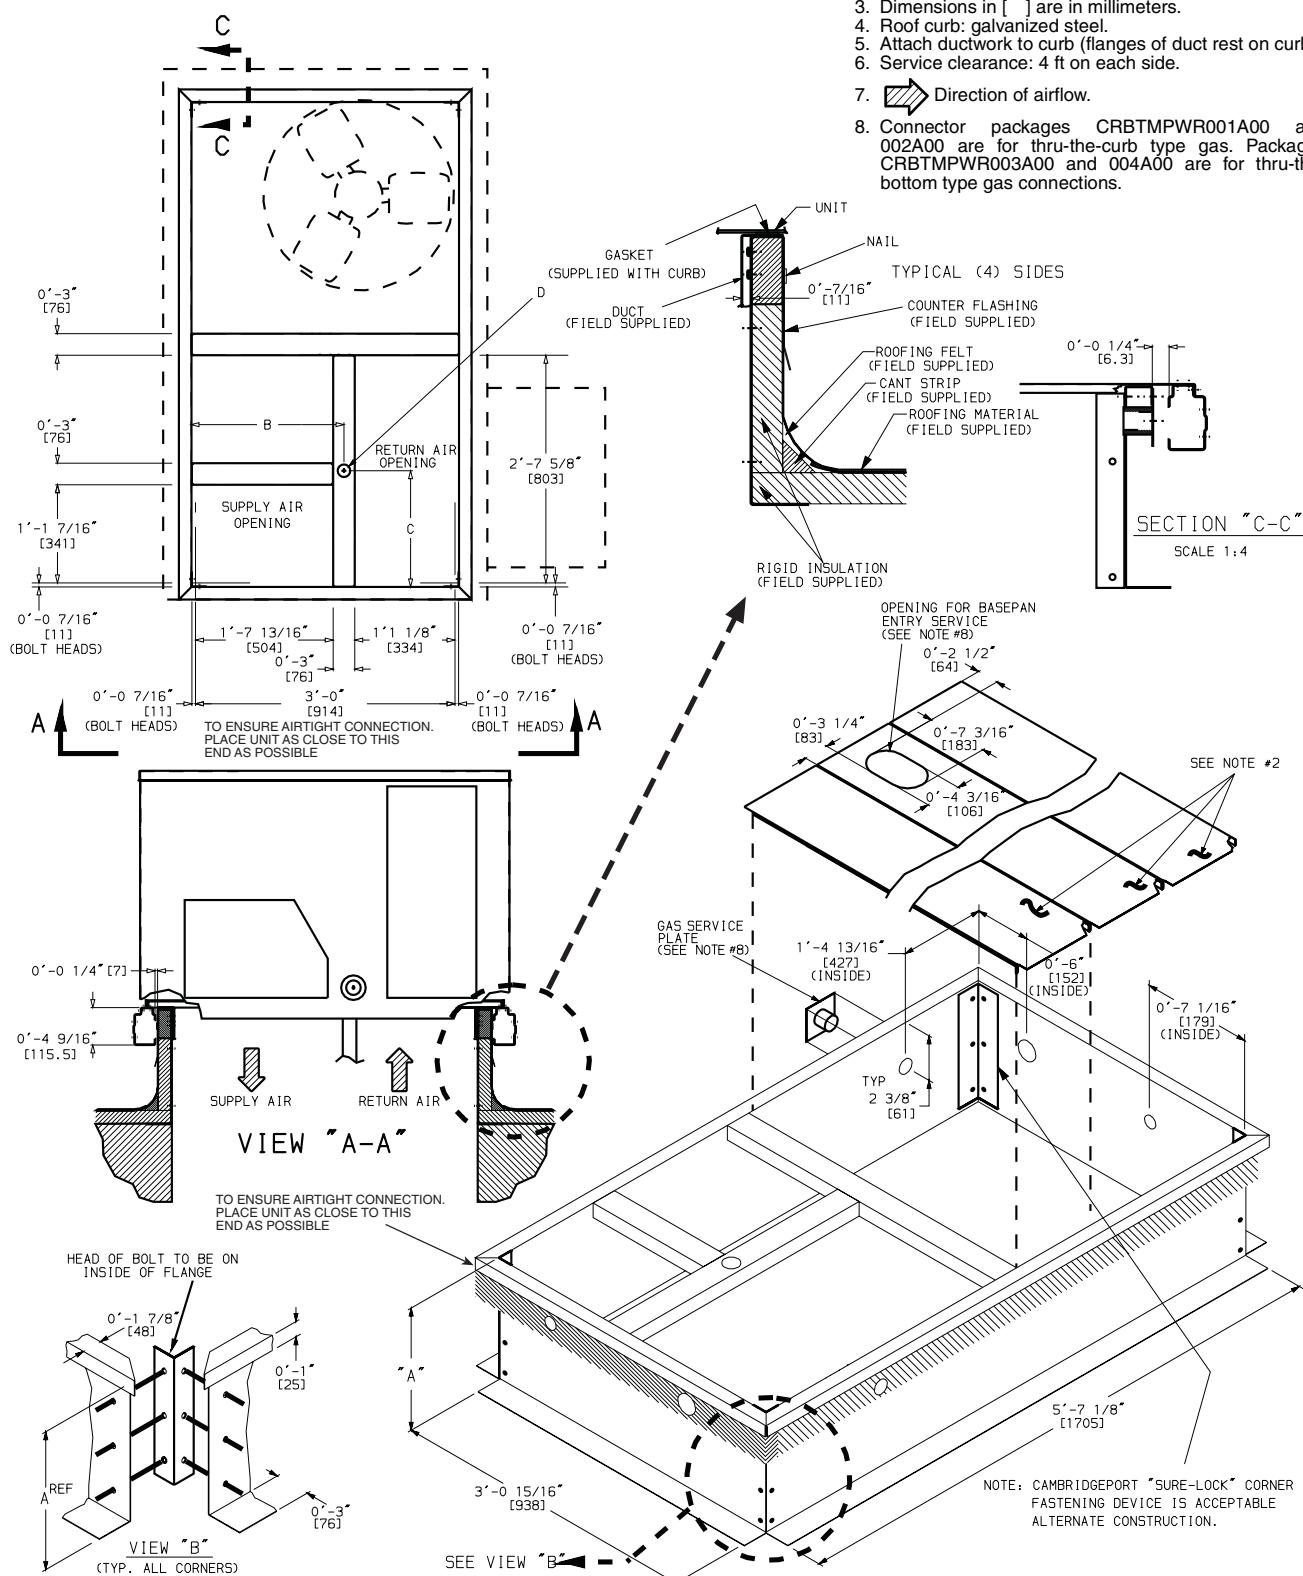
A — Roof Curb Details (48/50HJ004-007 Section Only)
